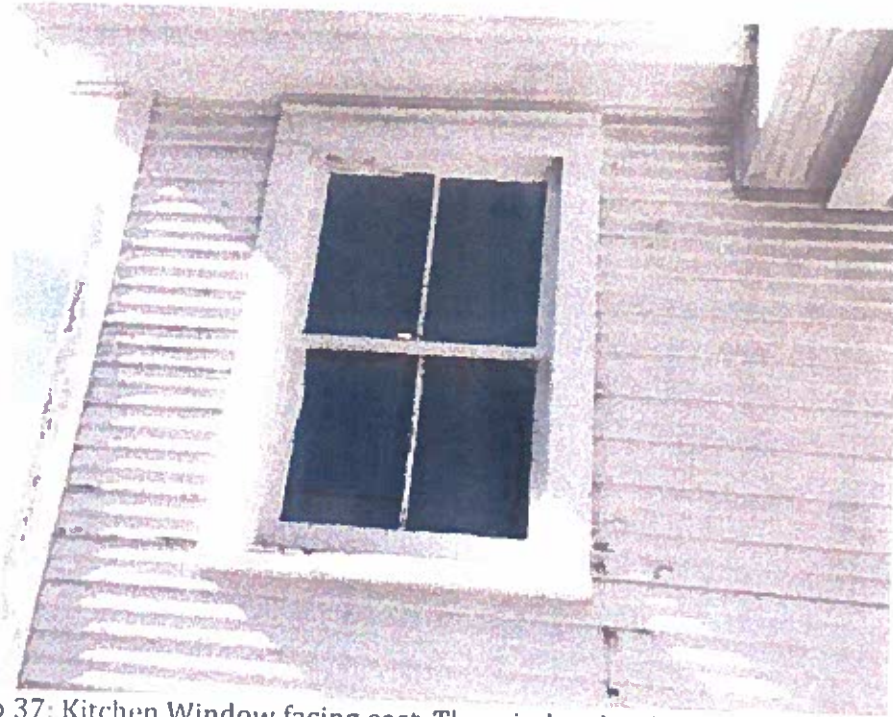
Kitchen Window facing east. The window has been replaced but some original trim remains.
